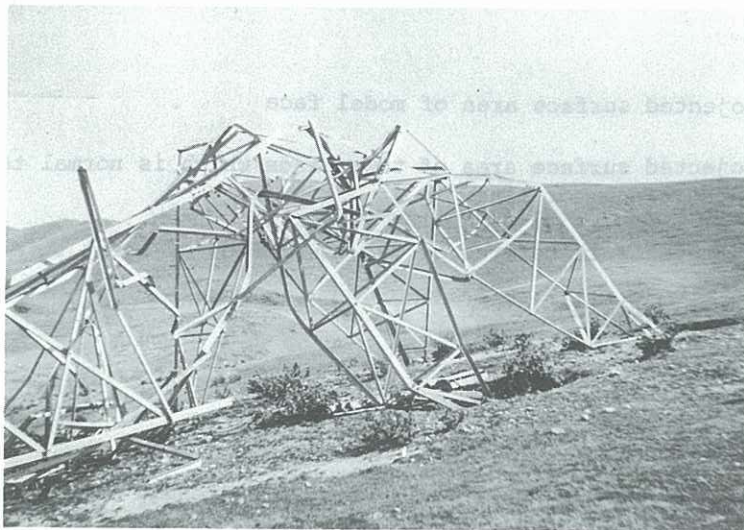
TOWER DAMAGED BY EXCESSIVE WIND LOADS ON TOWER AND CONDUCTORS
